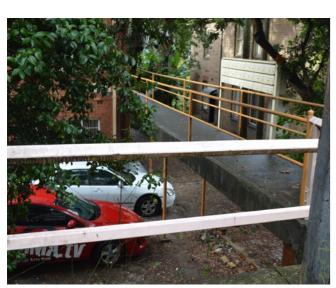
View of drop down interface between footpath and lot boundary on Walker Street
